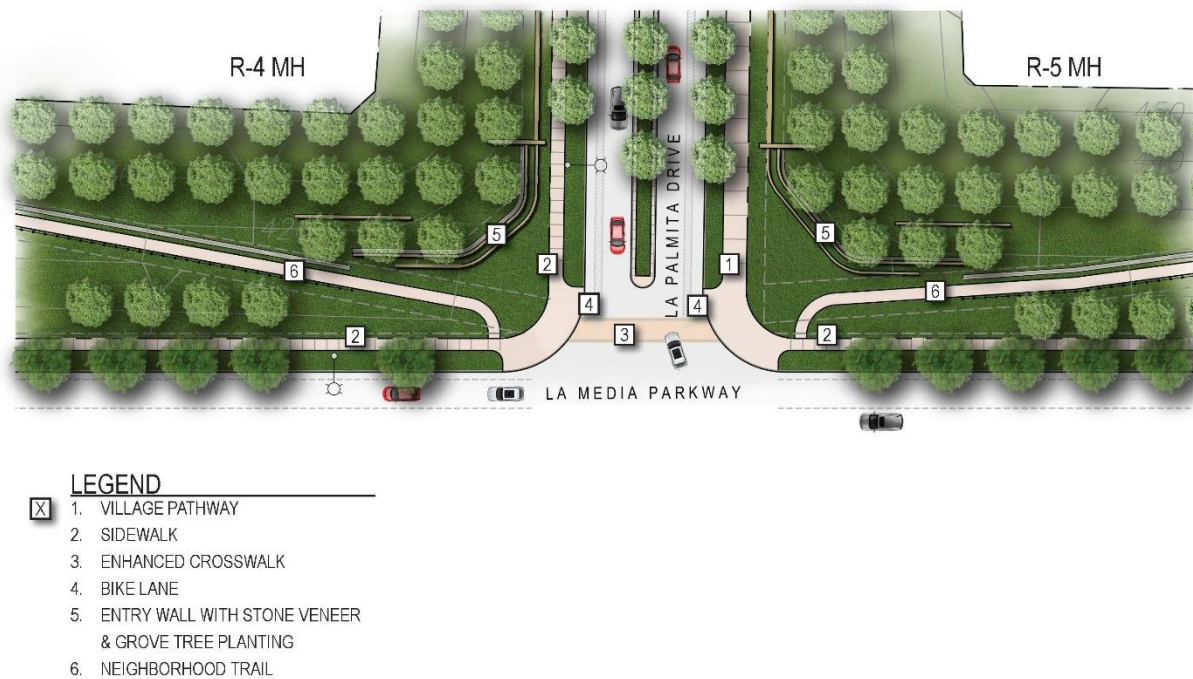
Secondary Village Entry Concept Plan (South Grove)
